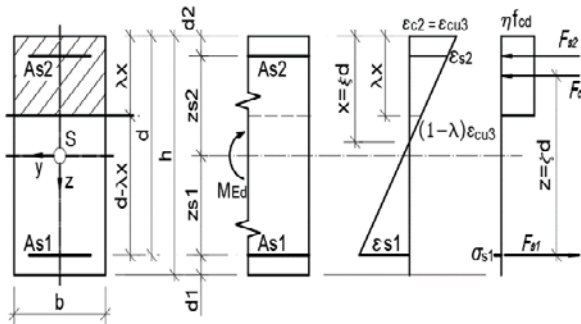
Dimensioning of reinforced concrete rectangular section subjected to plane bending
